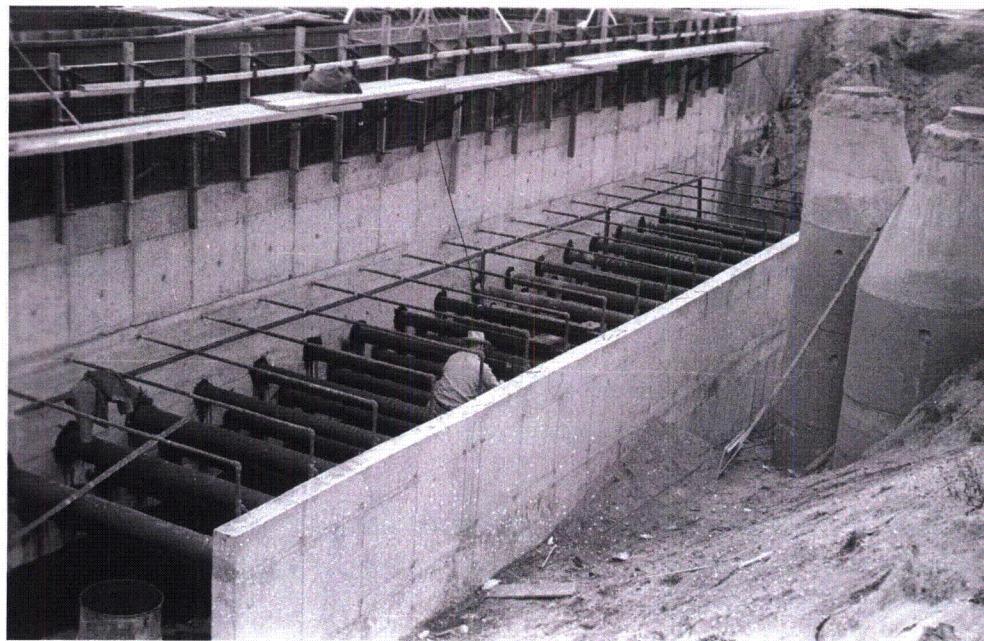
, Storage Ports under Construction – view from NW looking toward SE
